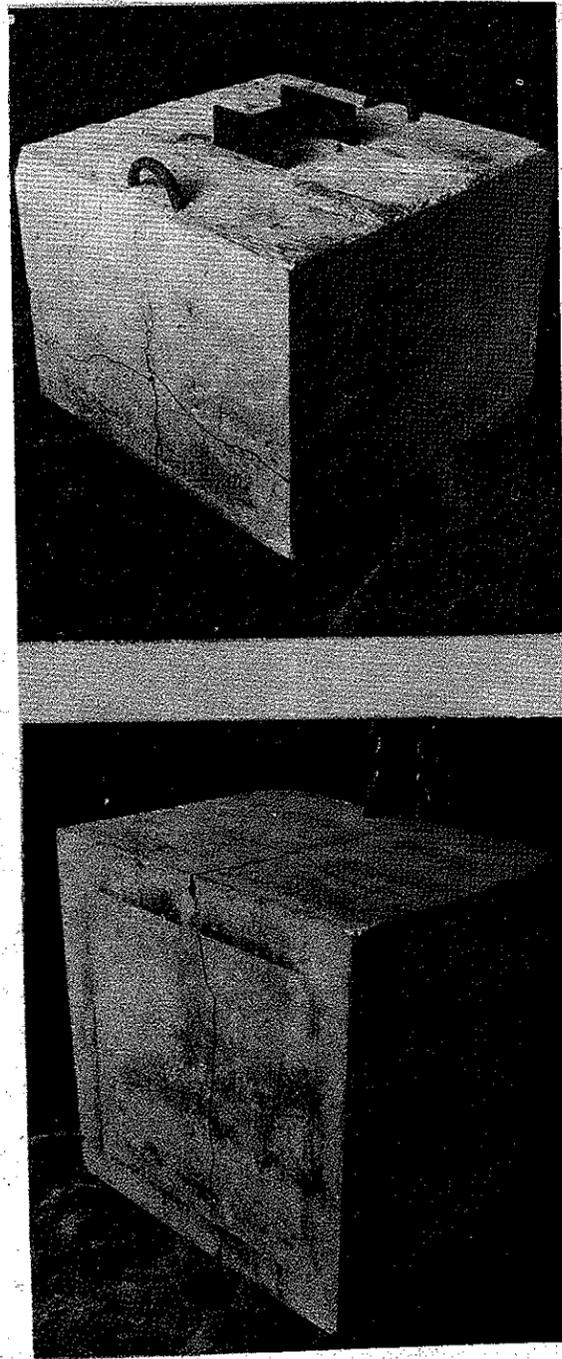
APPEARANCE OF SPECIMEN B-4 AFTER TESTING.
